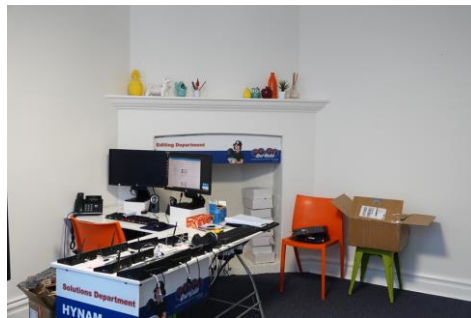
Original detailing to the south-west room includes rendered walls, timber skirtings and architraves (painted), 2 four-panelled doors, a fanlight over the door to the corridor, and 2 double-hung timber-framed windows. The fireplace to the north-west corner has a shallow-arched opening and a moulded mantle.
